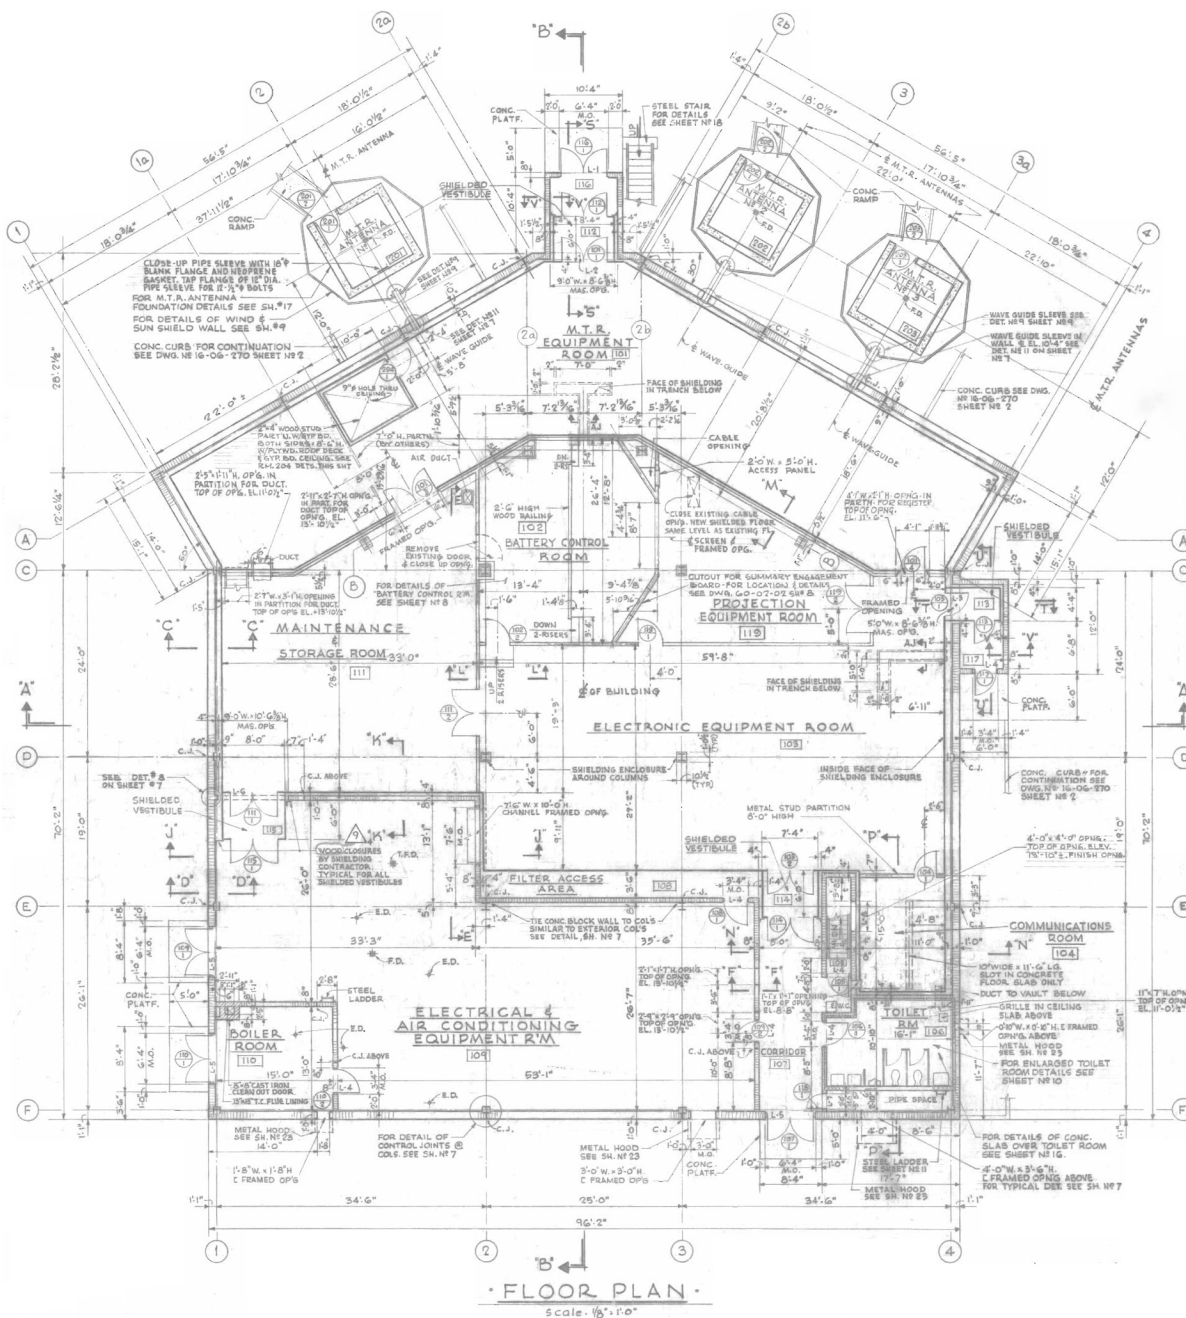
Property 23640 floor plan from 1959 WS-JO plans.
